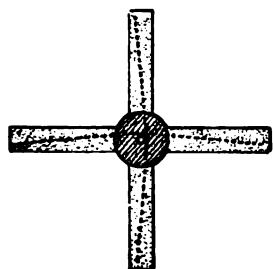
Cross-section at ground line of cement end post, showing the reinforced cement braces.
